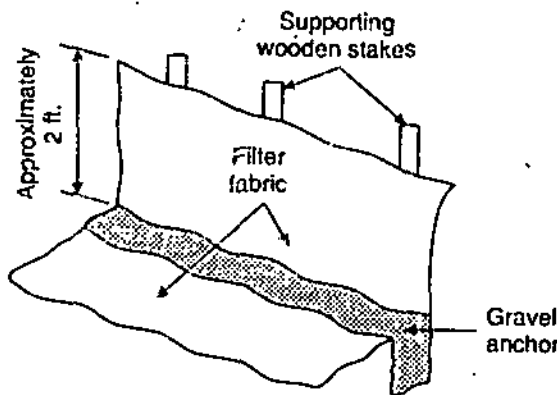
A temporary fence can be constructed to control erosion at a construction site.
